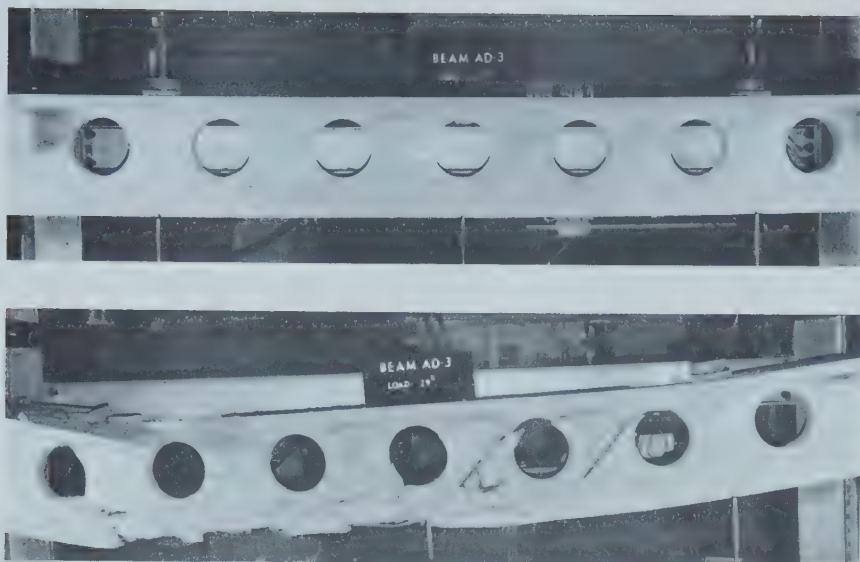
BEAM AD-3 CRACKING AND FAILURE PATTERNS
